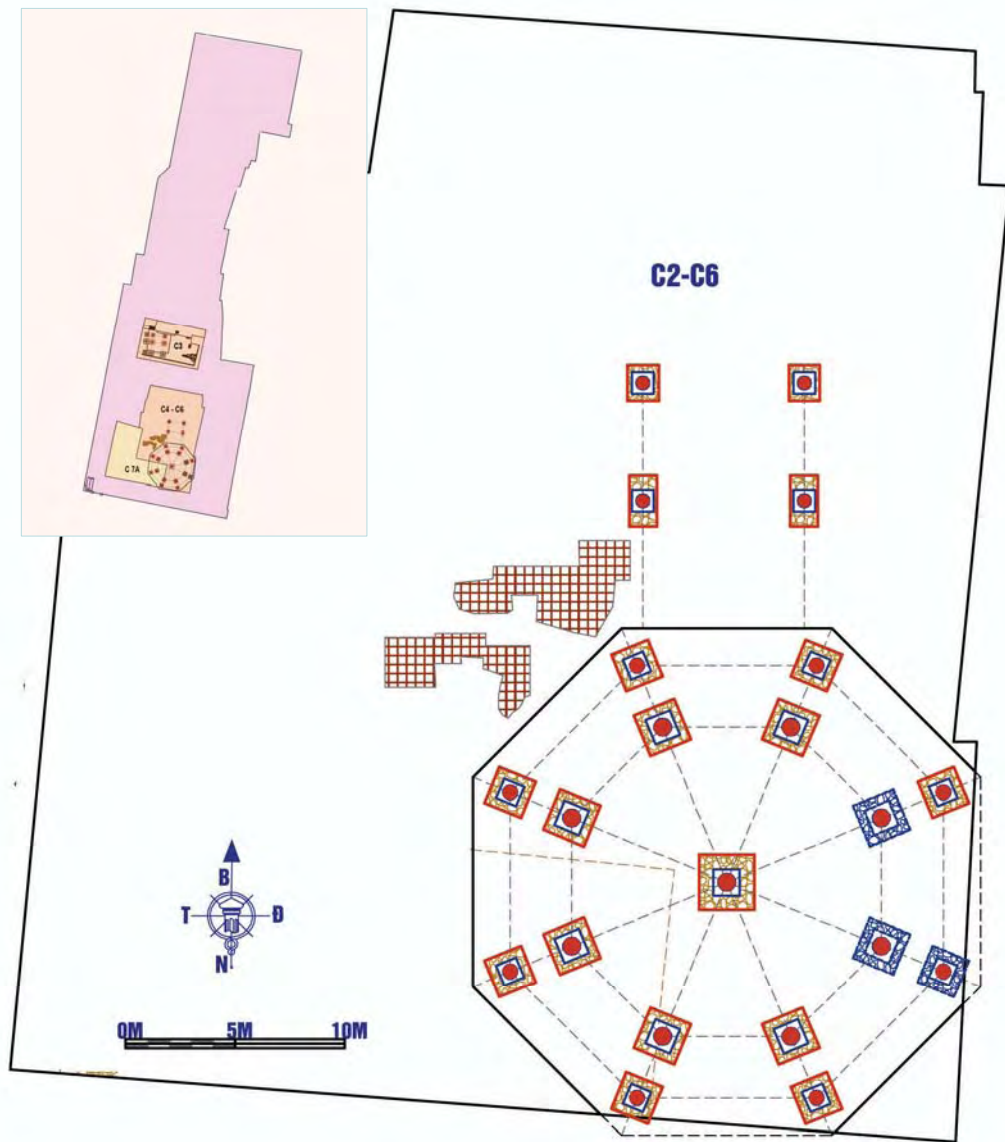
Plan for one architectural unit having 13 apartments and 3 pillars belong to Ly dynasty, at the centre of Section B
